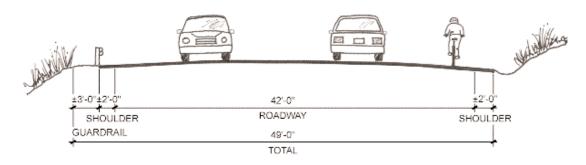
Existing Conditions at Lincoln Boulevard at Pershing Drive North
